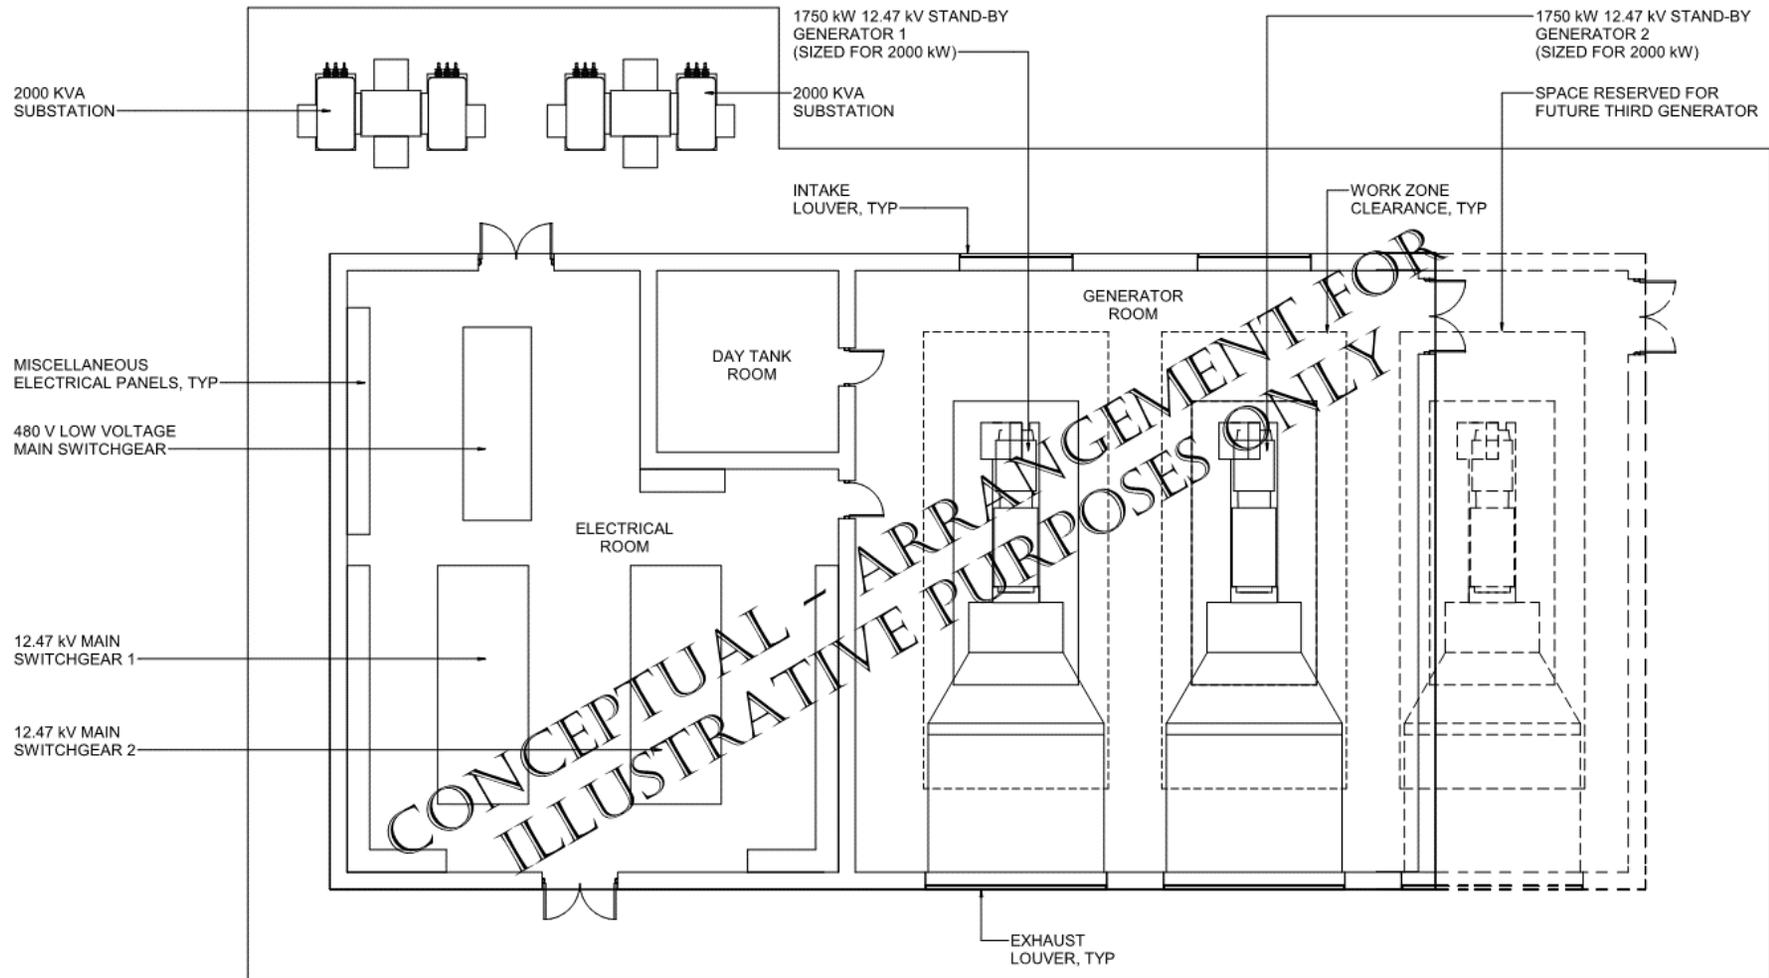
Potential concept for Main Electrical/Generator Building floor plan
